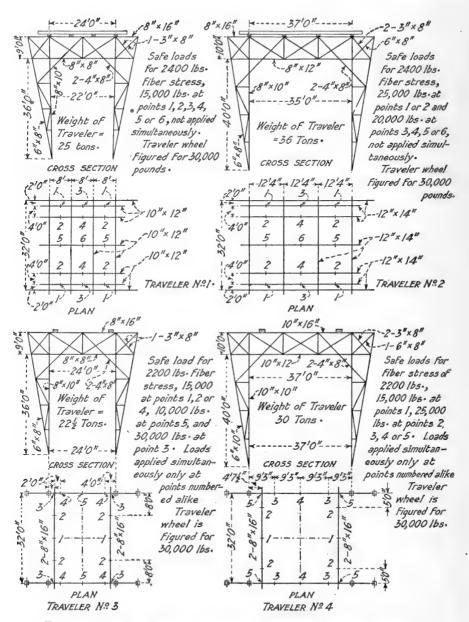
STANDARD TIMBER TRAVELERS. AMERICAN BRIDGE COMPANY.
